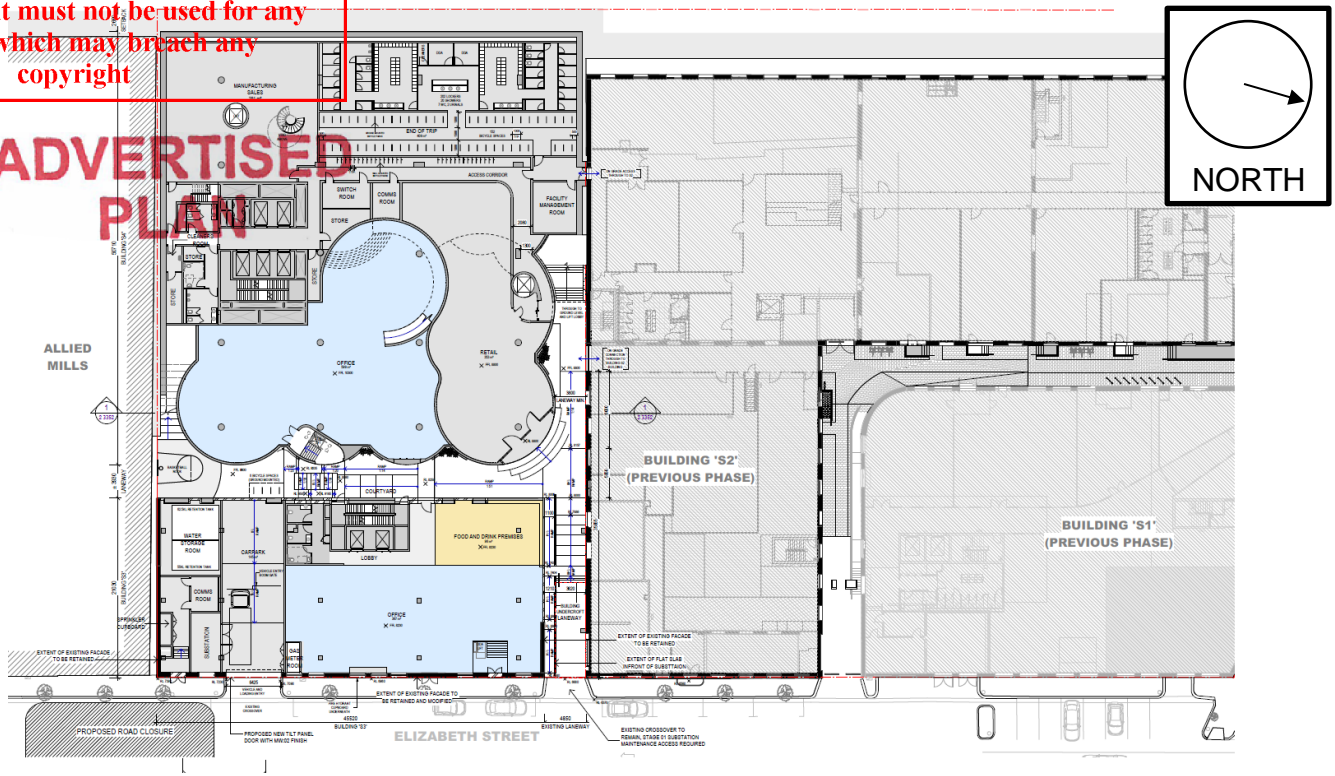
Lower Ground floor plan of Stage 2 of the proposed 2-50 Elizabeth Street development
